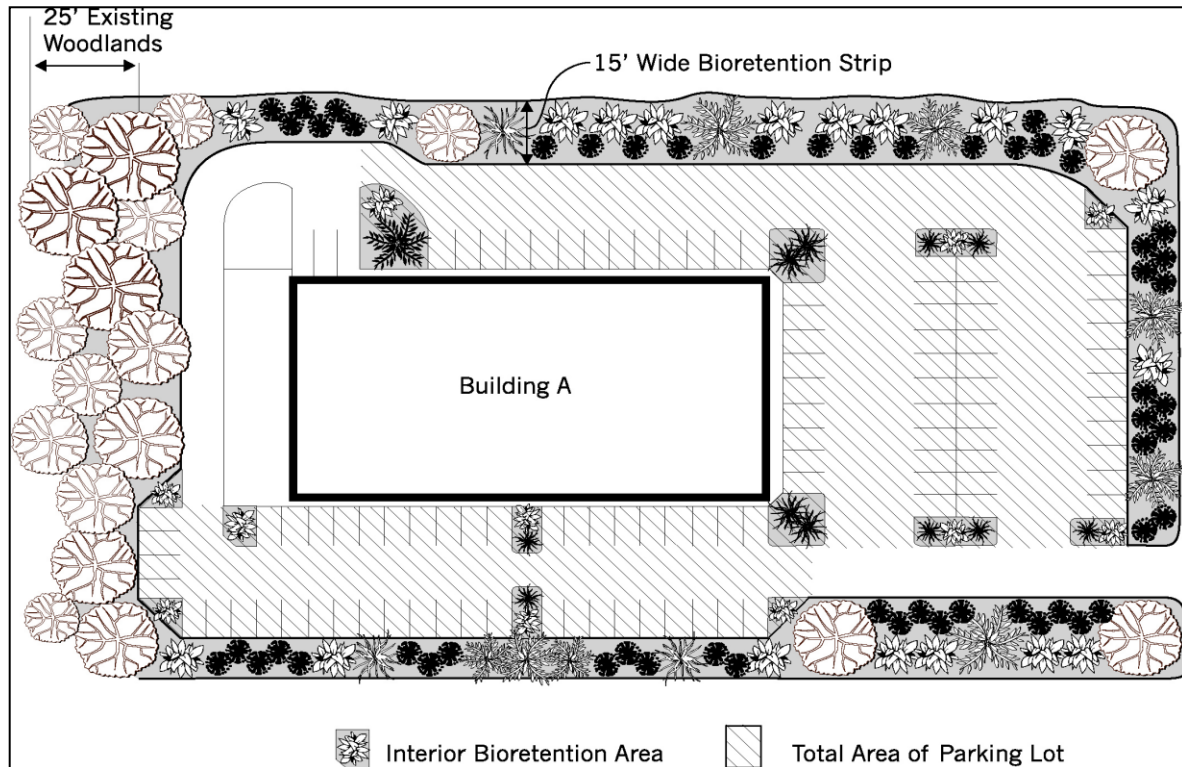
Providing Bioretention Within Landscaped Buffer Areas
